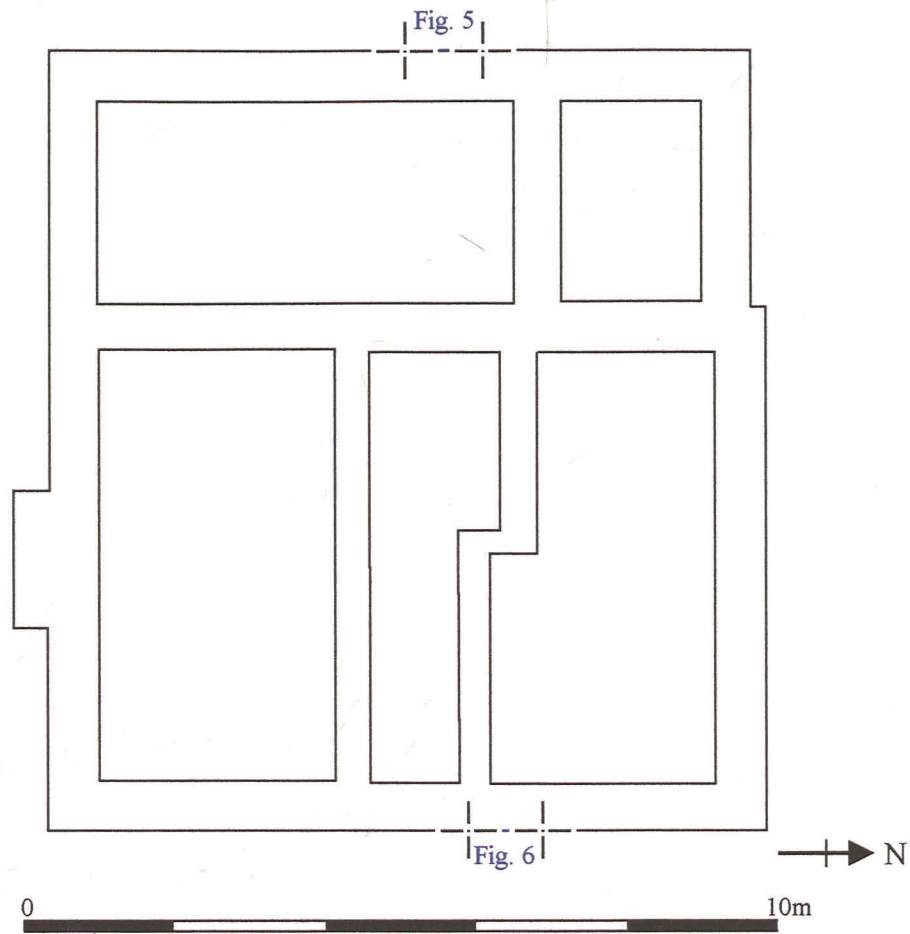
Plan of the house showing the position of the sample sections shown below. Scale 1:100
